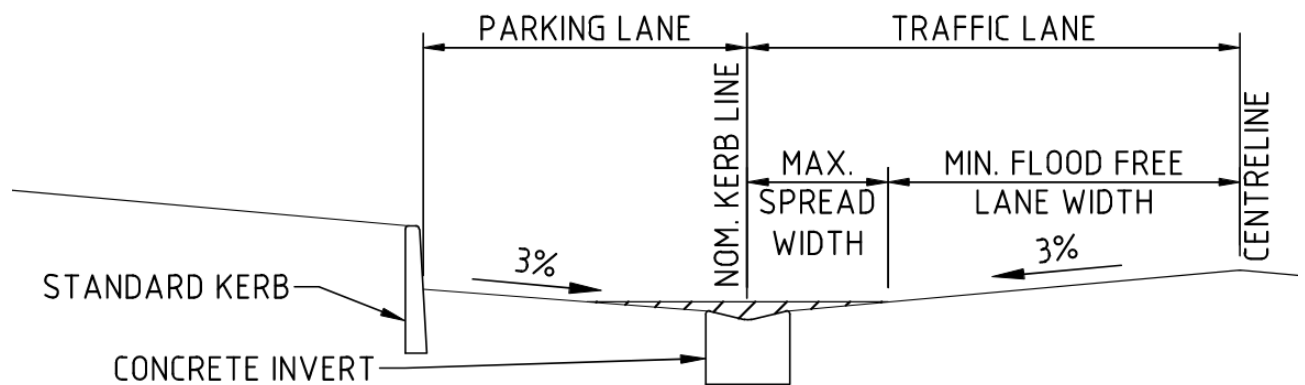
Spread Width – Streets with on-street Parking - Option 2
